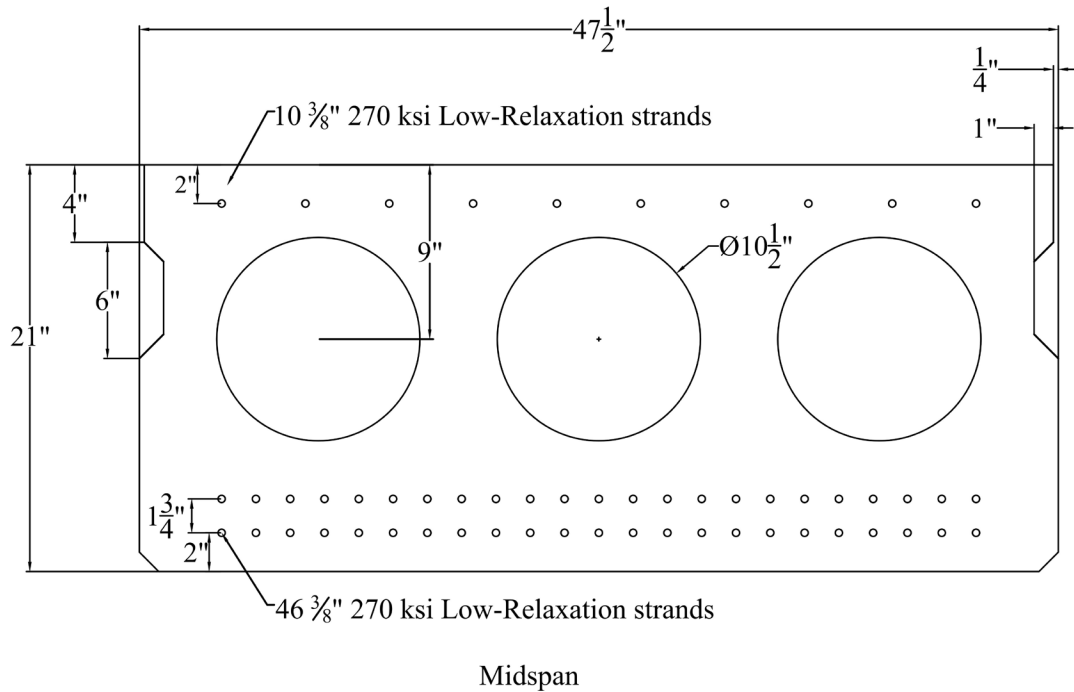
Rehoboth Bridge beam (Type A) cross section
